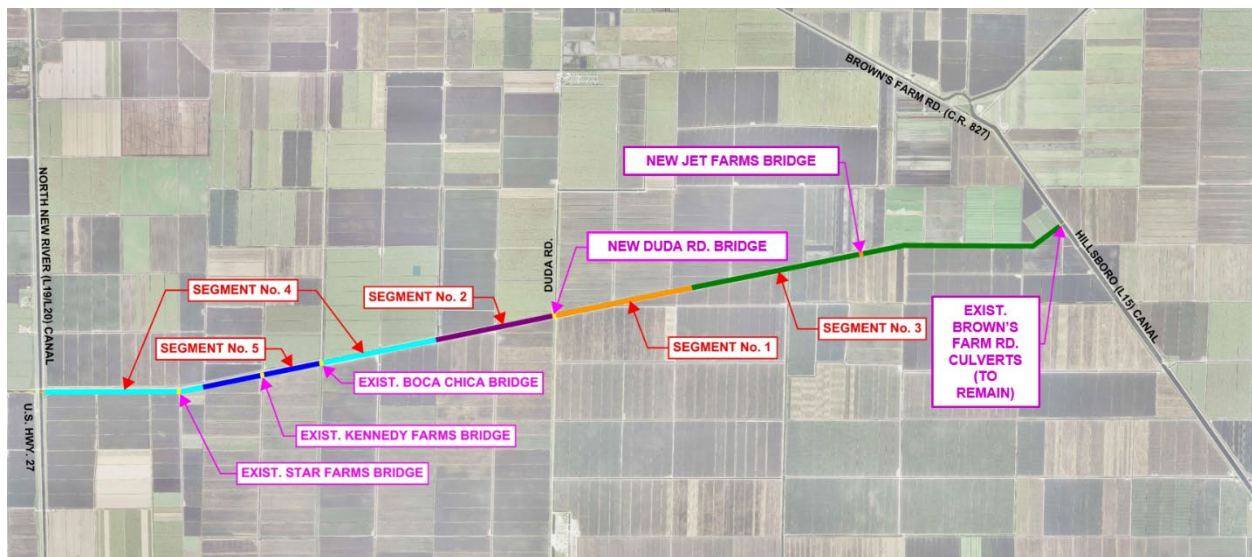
A-5. Bolles East (L-16) Canal Conveyance Improvement segments and bridges. (Note: The New Duda Road Bridge was included in Segment No. 1.)
